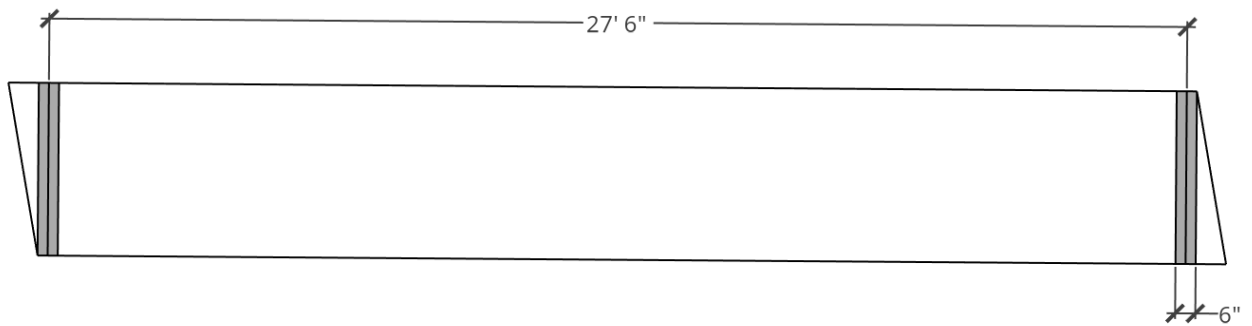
Photo. Schematic plan of the bridge beam showing location and orientation of supports relative to the skew of the beam.
